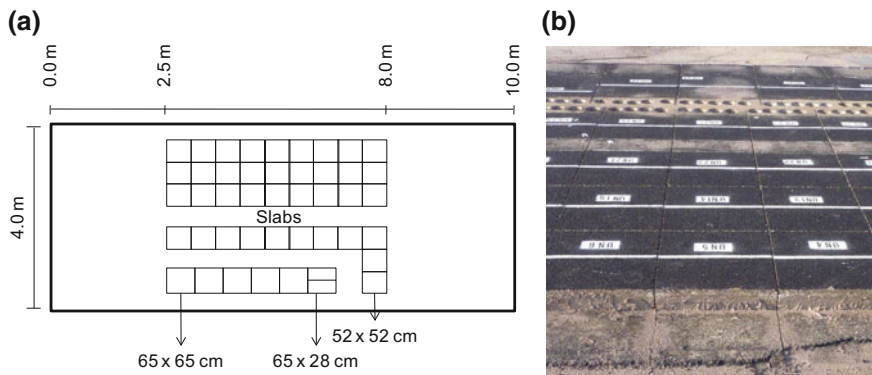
Section A: a layout of each experimental sub-section; b detail of prepared slabs from sub-section UN
